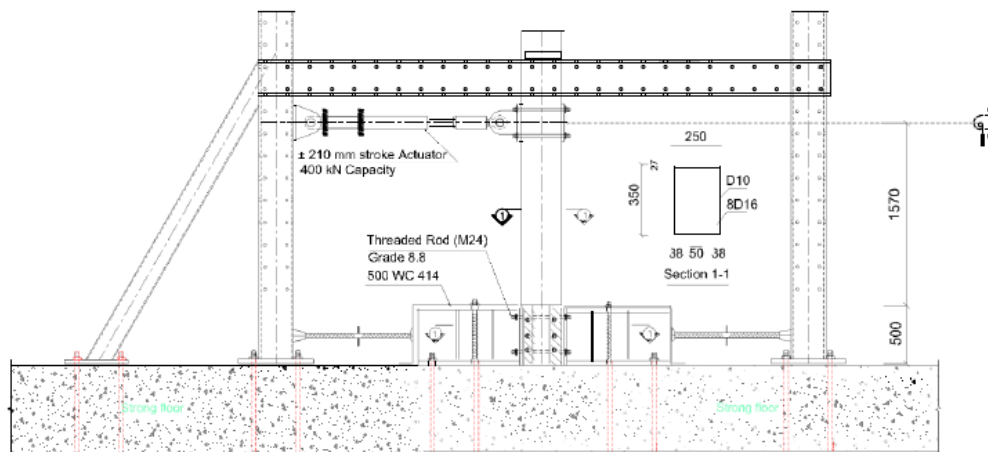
Test setup and specimen details (Malek et al., 2016).
